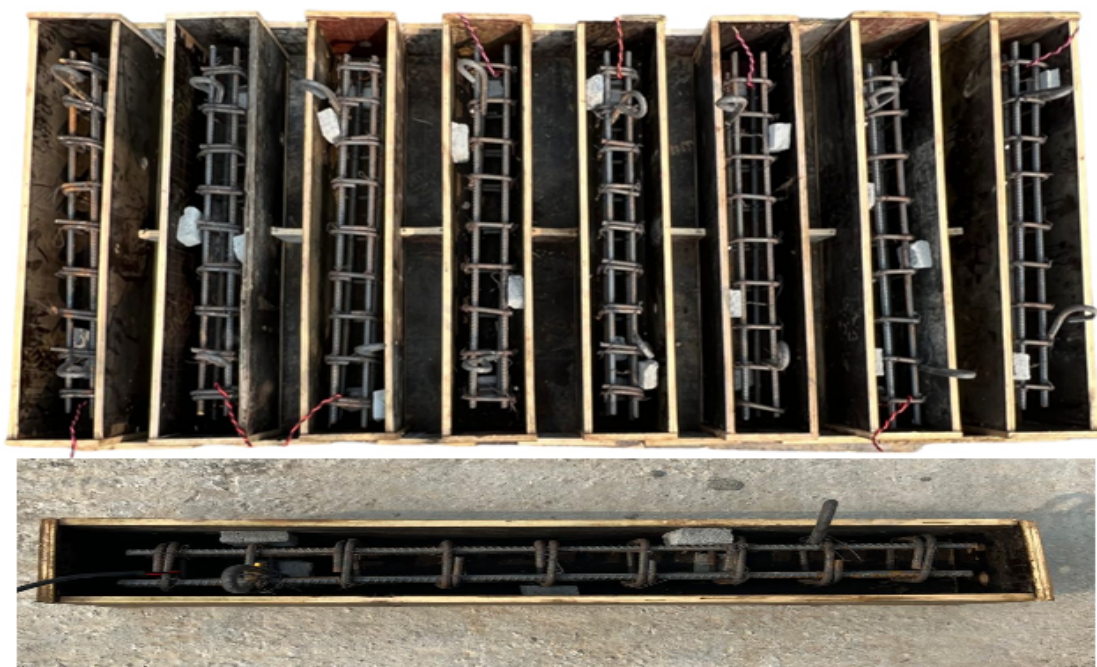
Beam steel skeleton placement in wooden Frame
